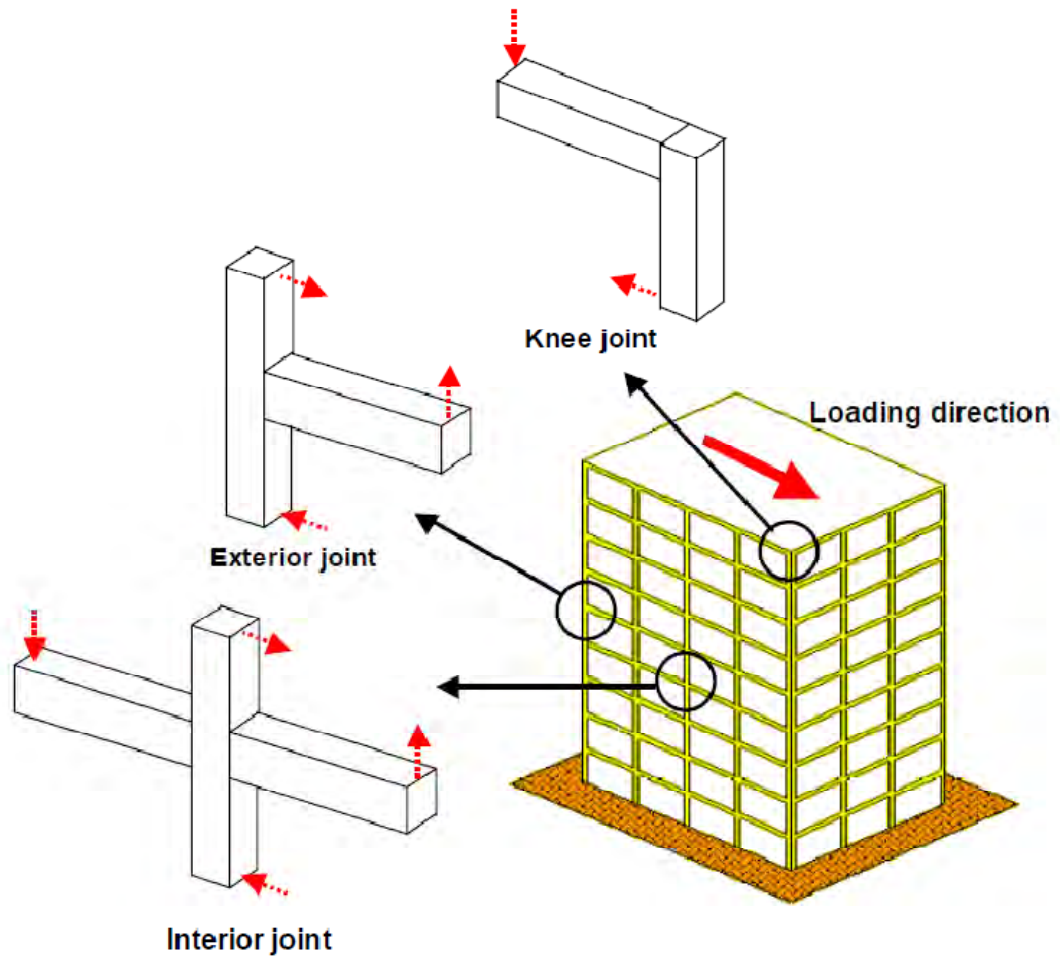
Forces acting on beam-column joints in a building structure (James M. Lafave, 2009)
